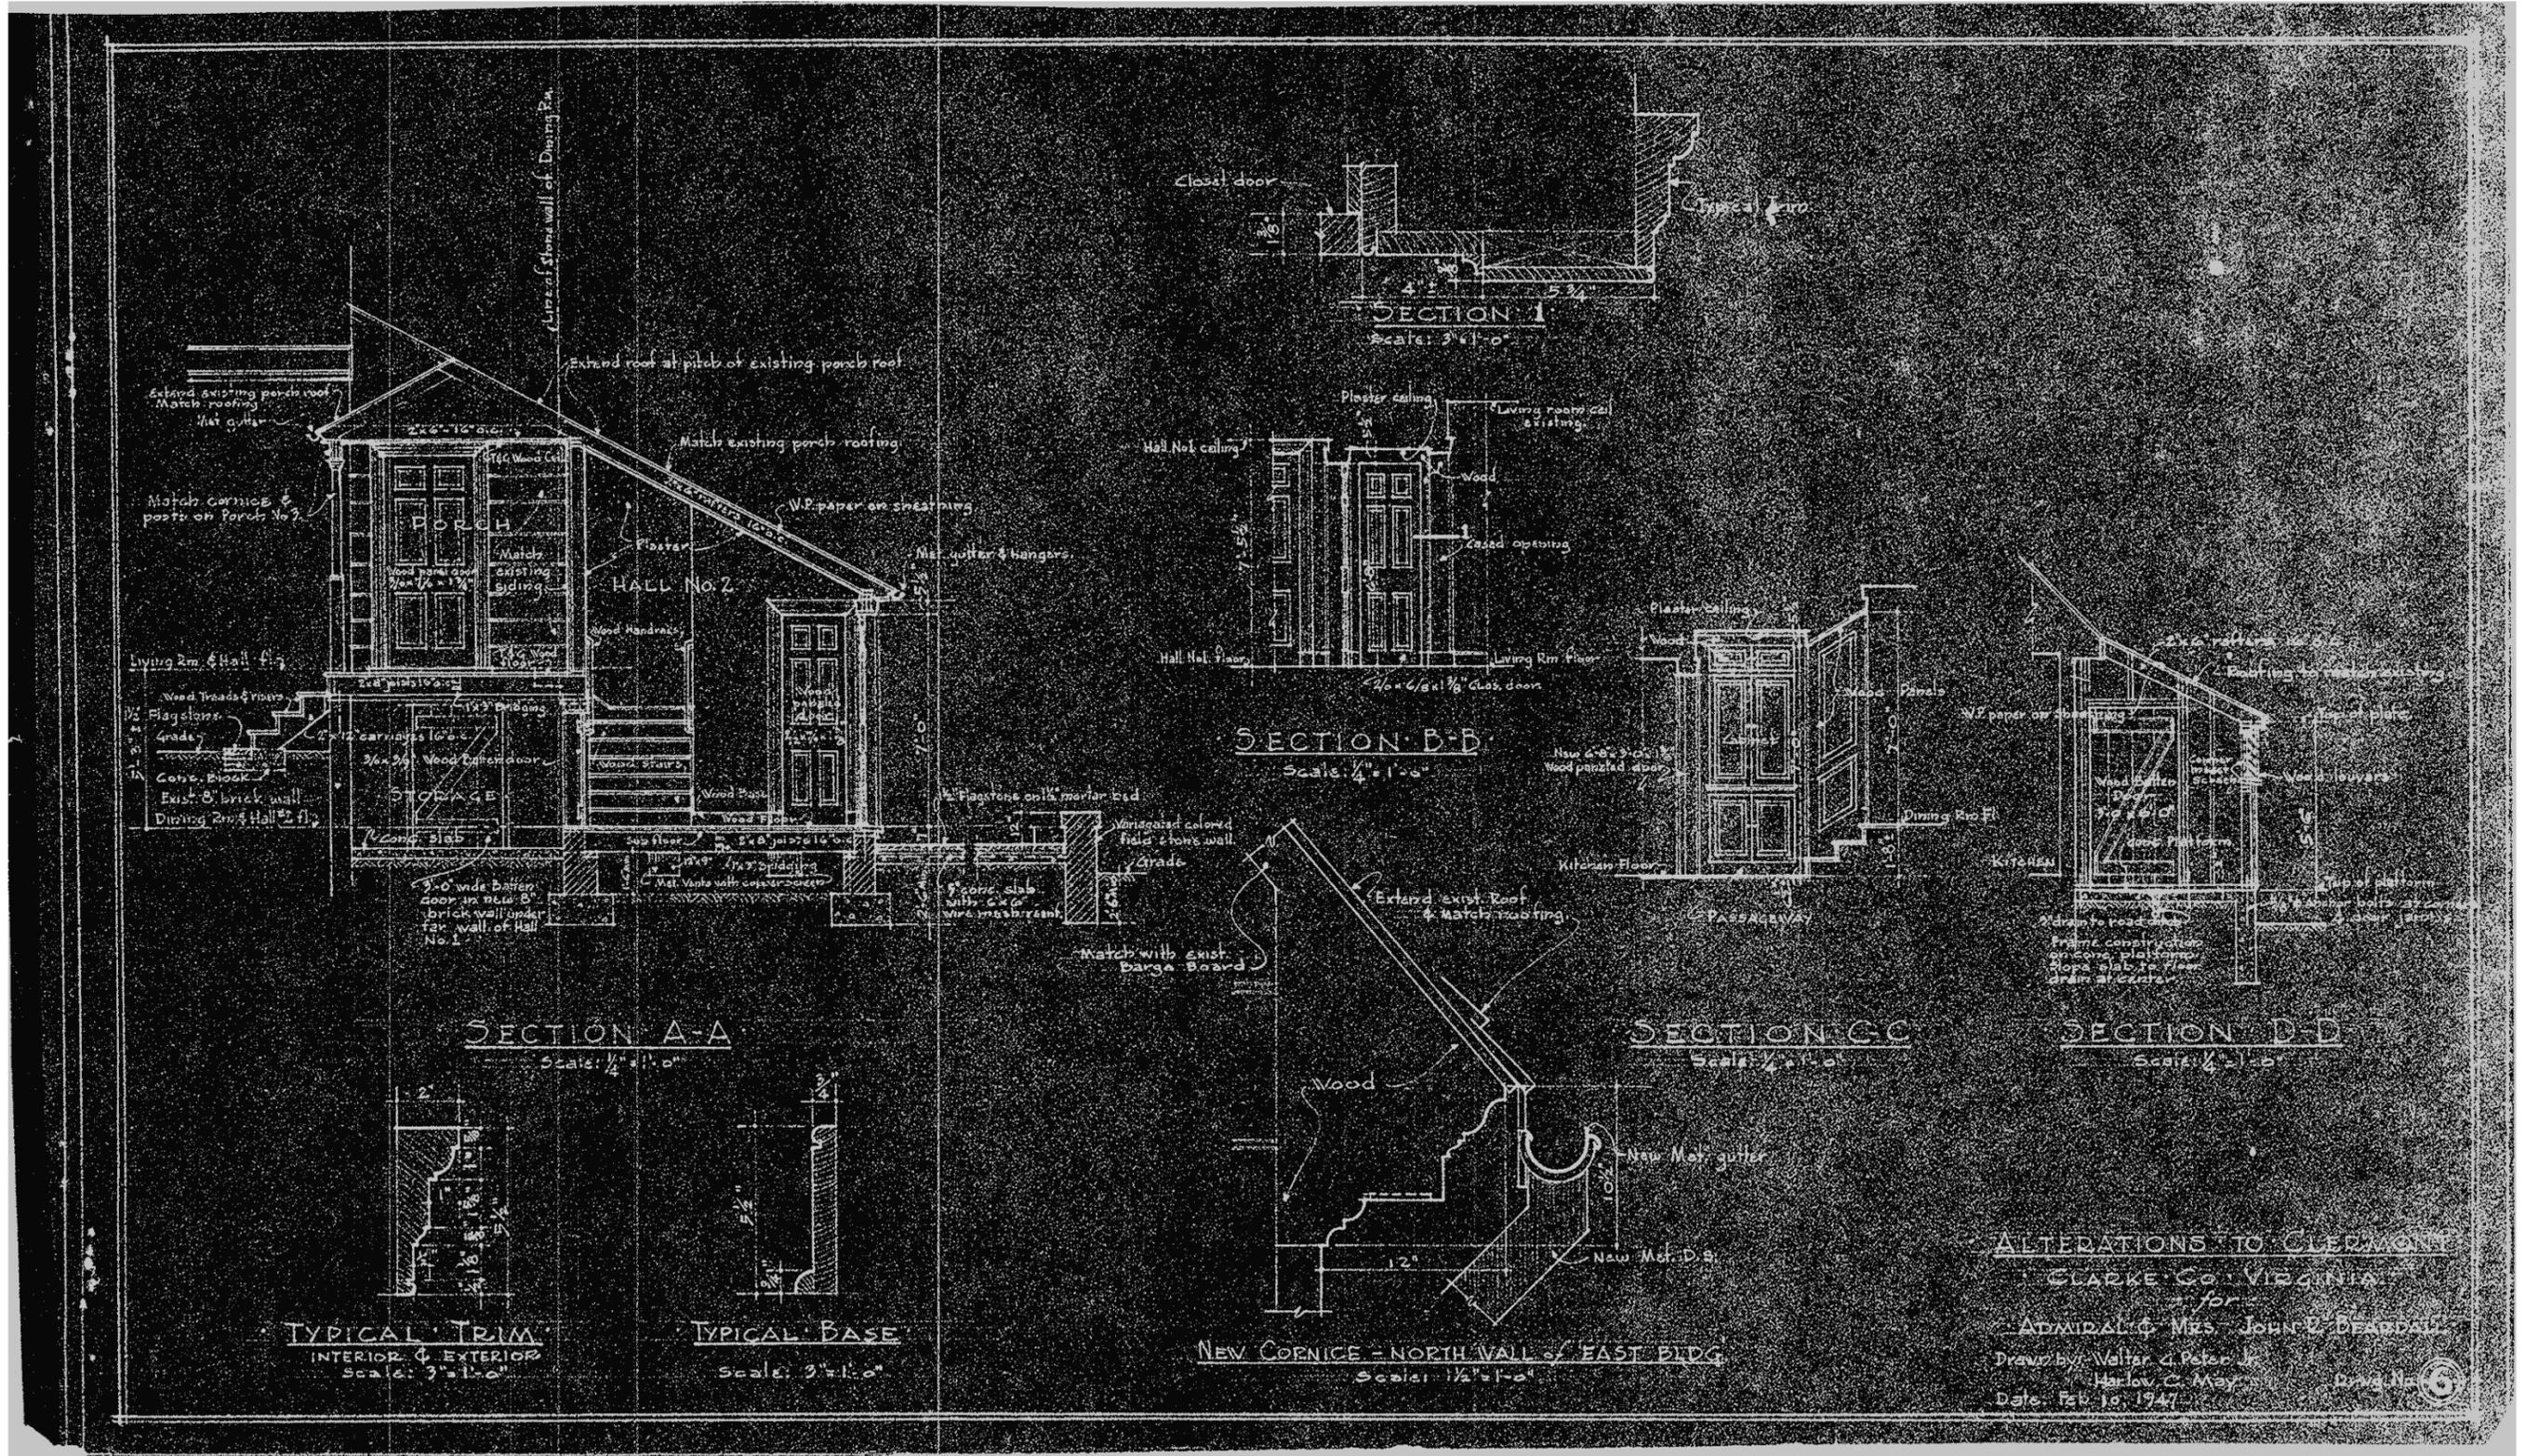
Wall section and details of the 1947 alteration construction drawings (not to scale).
